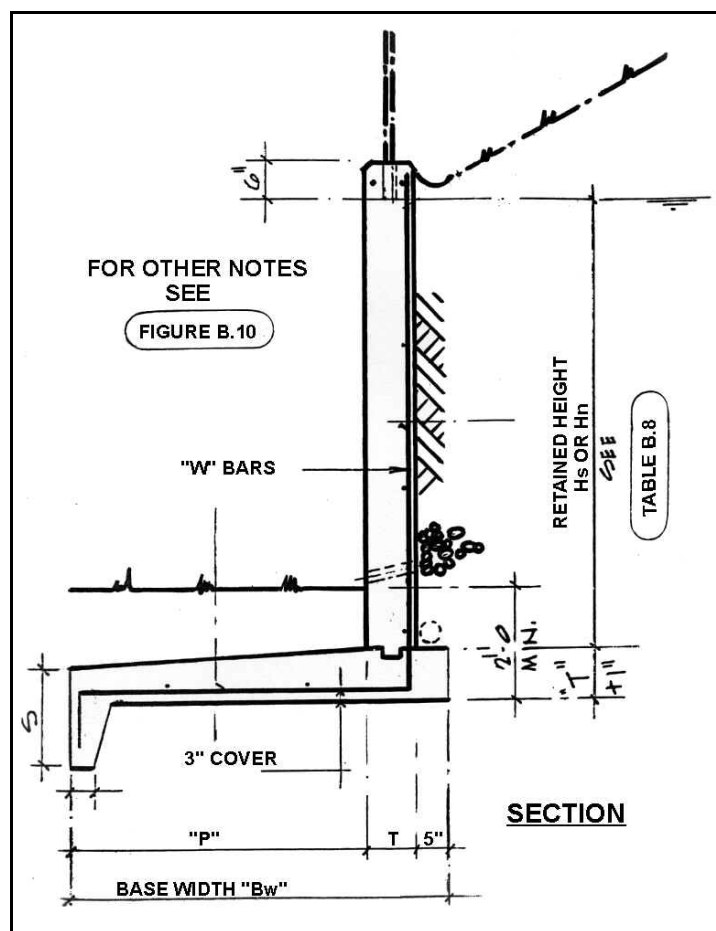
Concrete cantilever retaining wall, toe out, H = 4' to 14 feet (Bernier, 1995).
